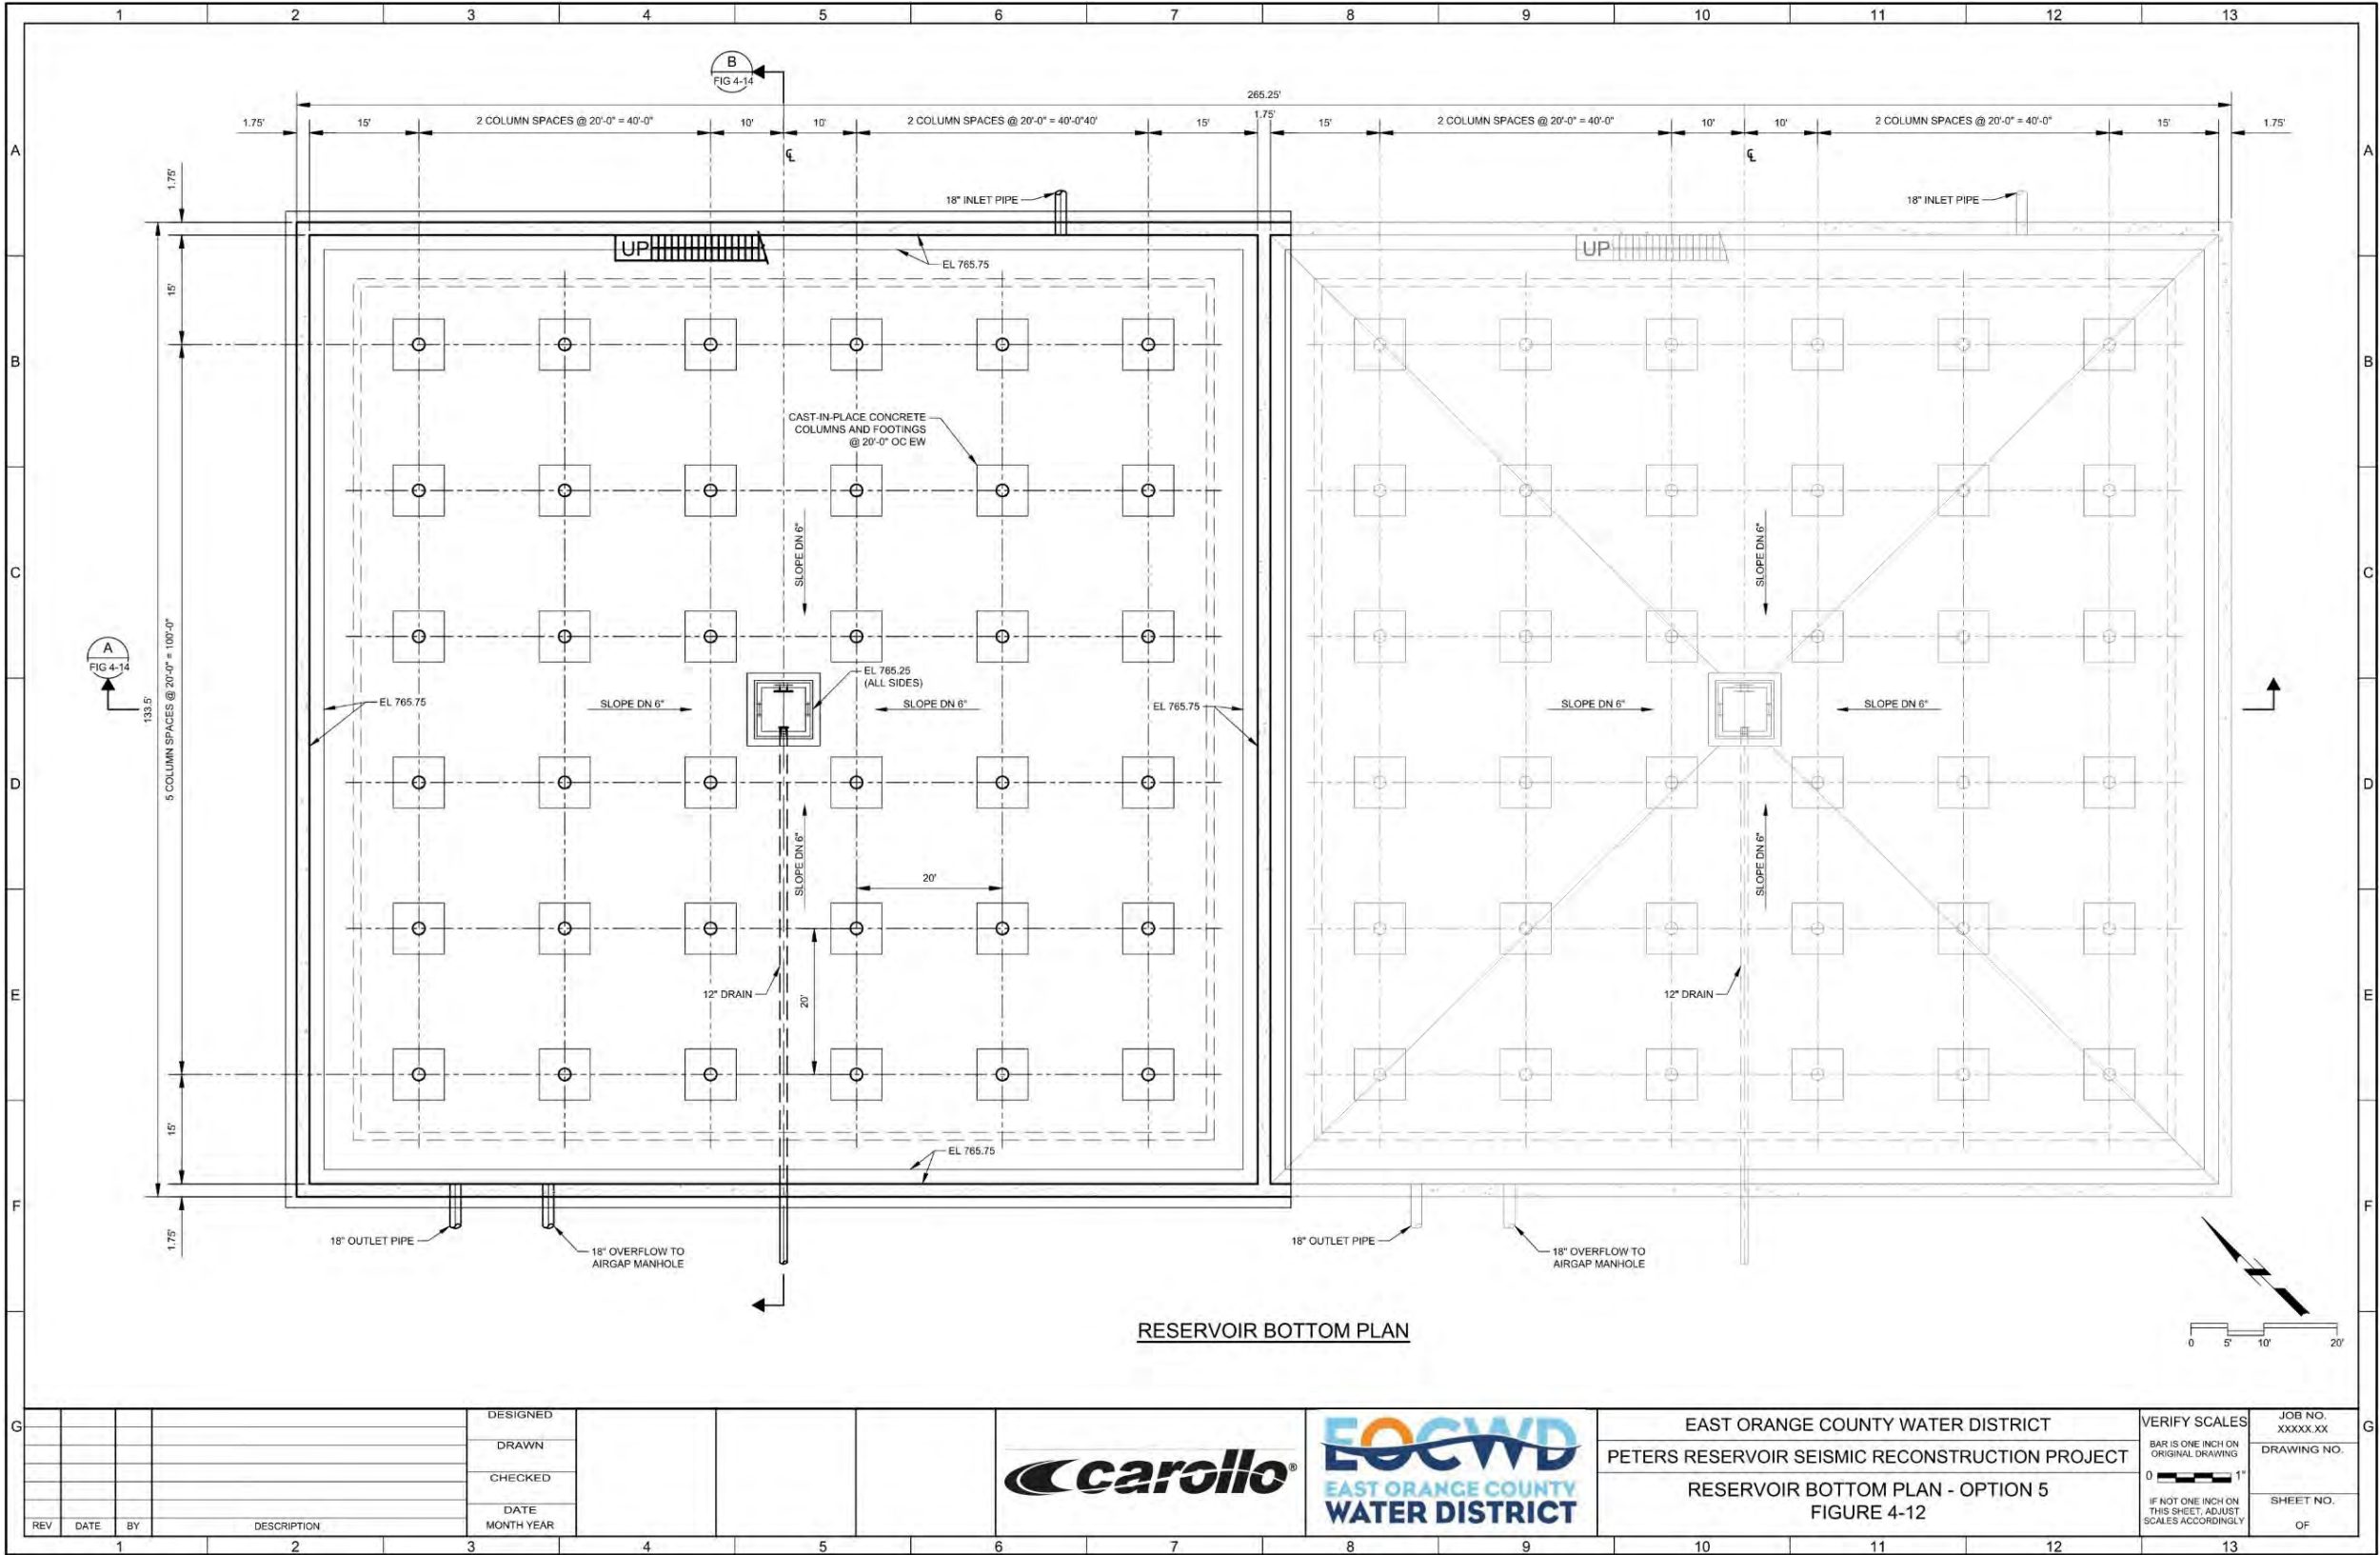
Option 5 Conceptual Structural Reservoir Bottom Plan
